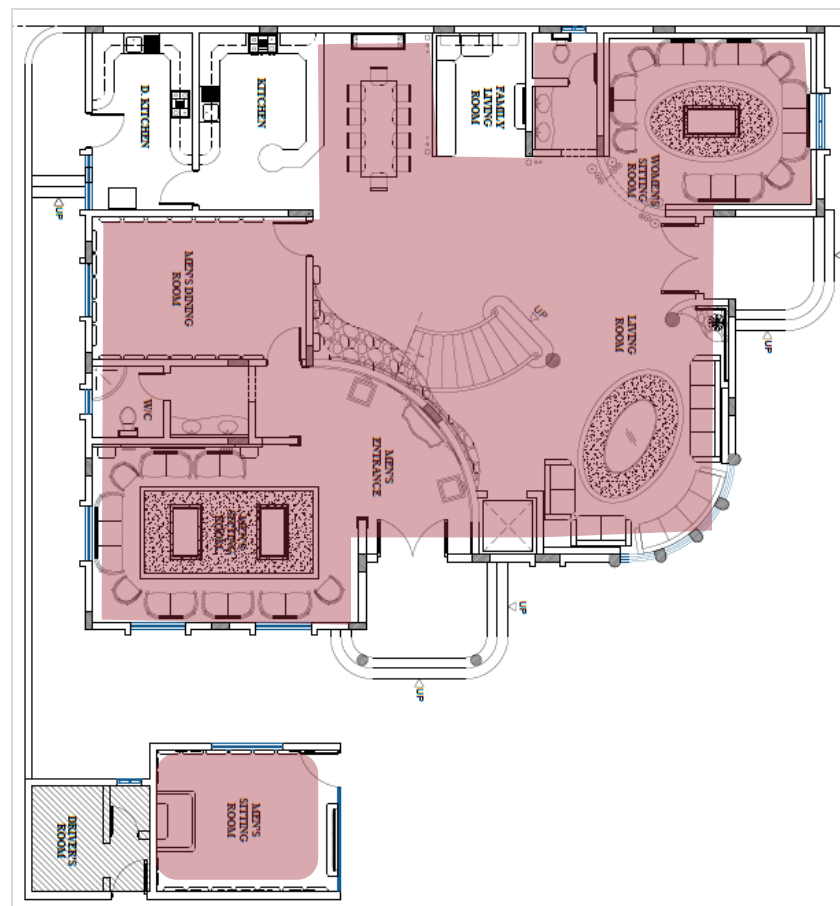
Spaces aimed for guests in the ground floor level of a new house
